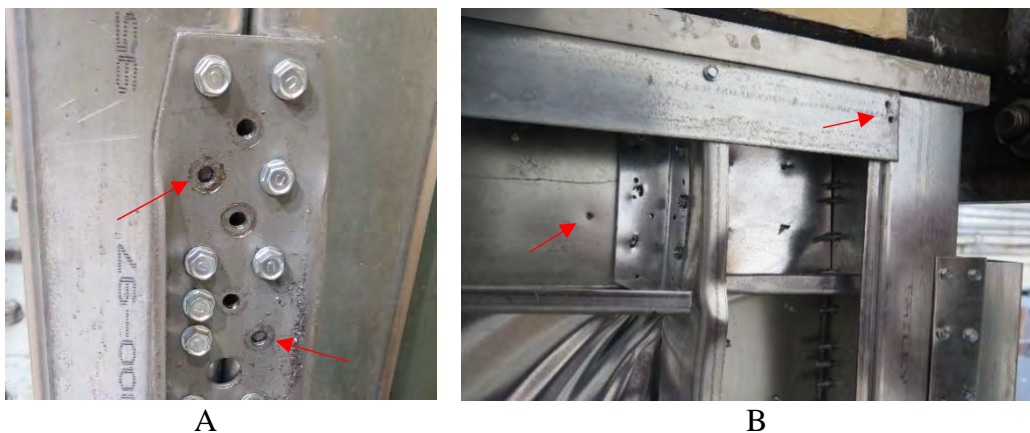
A) Shear failure of holddown screws. B) Shear failure of sheathing and track screws.
